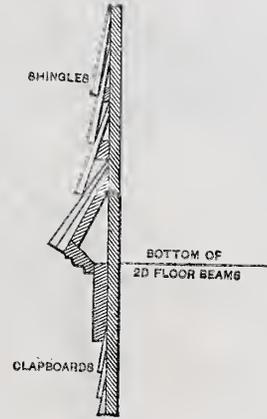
Second Story String Course.—Scale, 1/2 Inch to the Foot.
